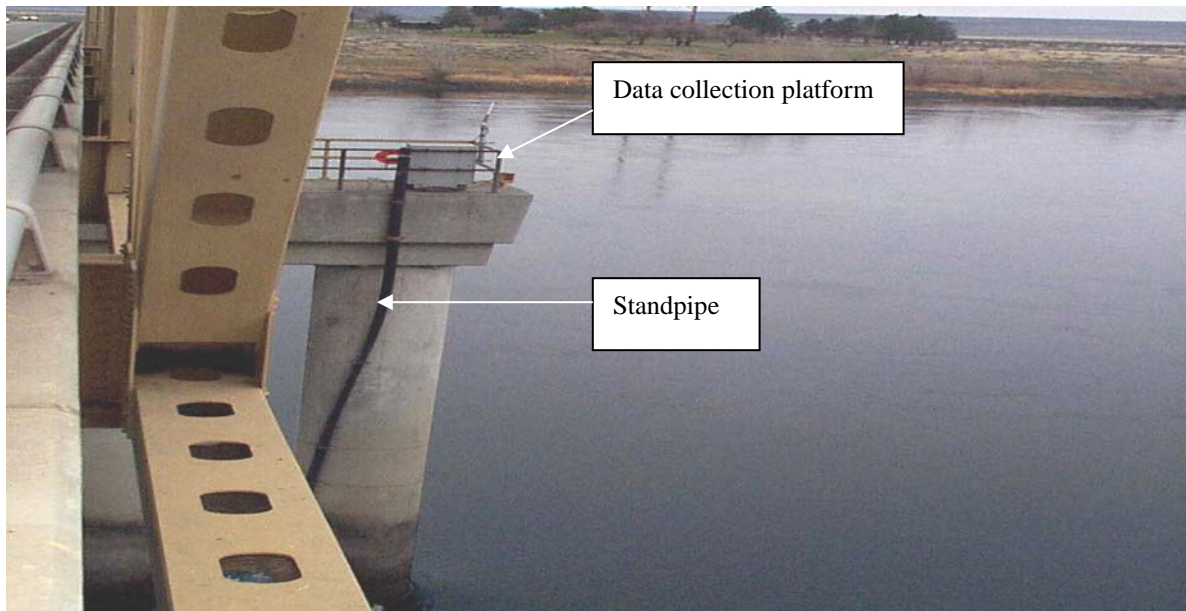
Photograph of Priest Rapids Dam tailrace water quality fixed-site monitoring station (FSM station), looking to the west from Vernita Bridge. Priest Rapids Project, mid-Columbia River.
